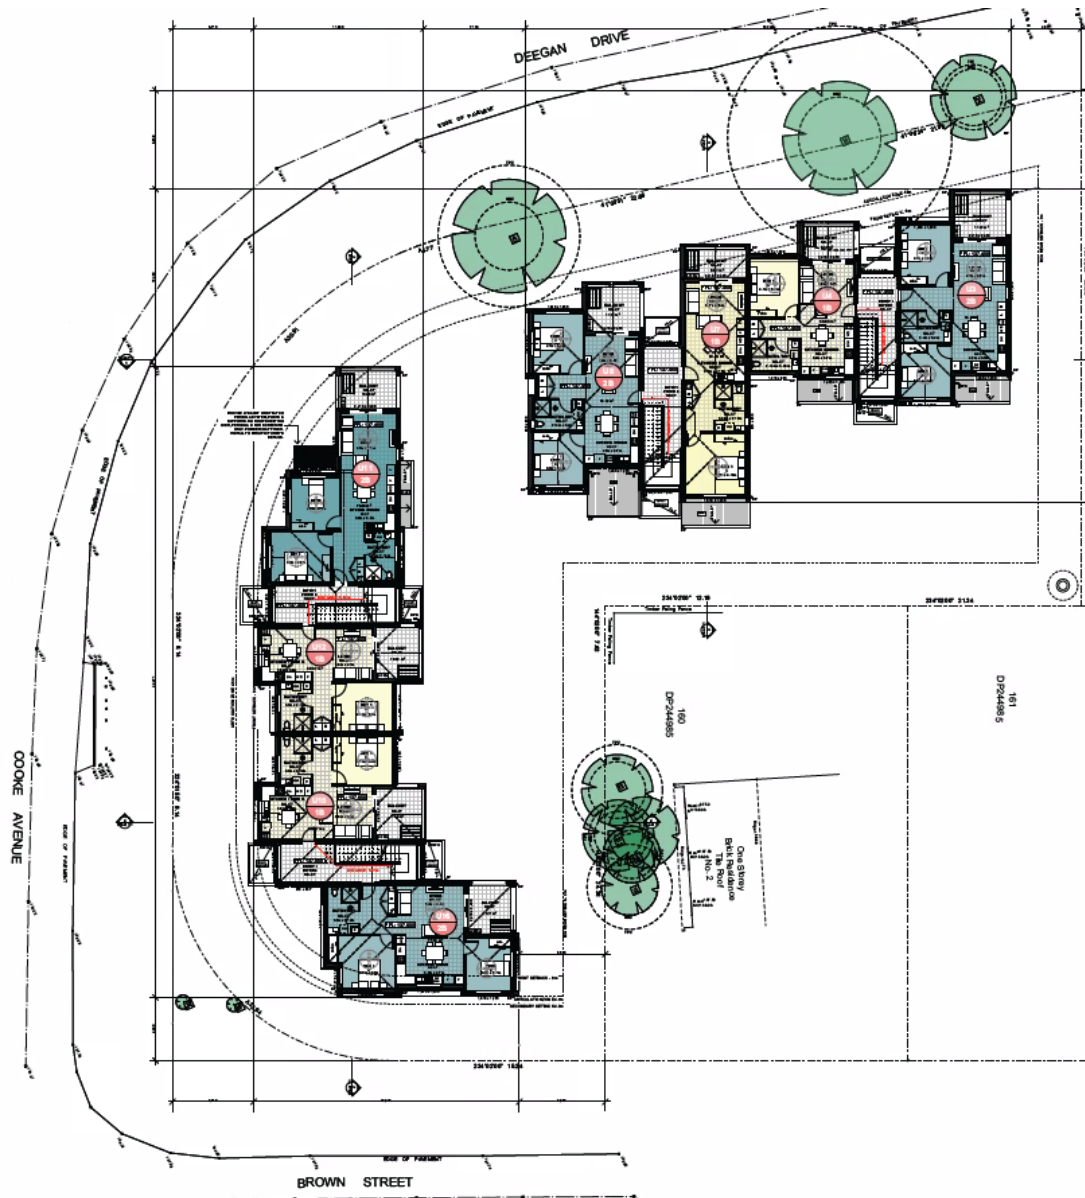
Extract from Architectural Plans – First Floor Plan (Source - DTA Architects 2023)
